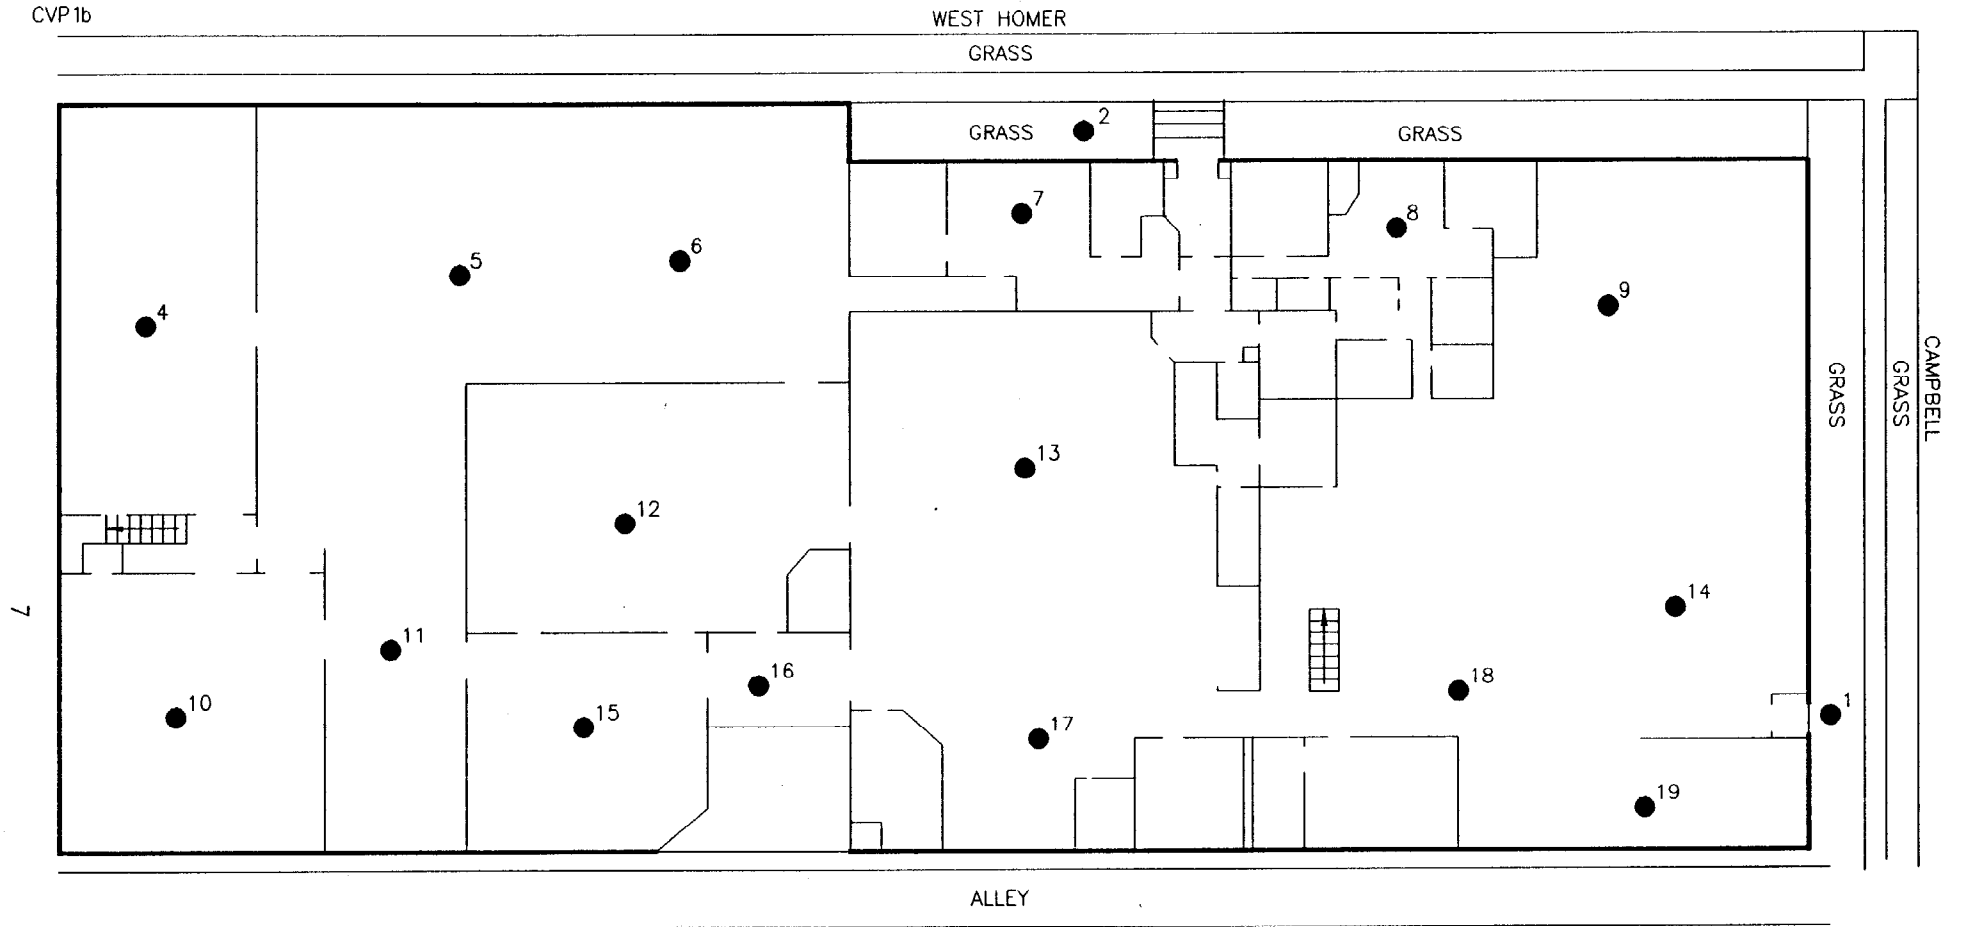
Floor Plan of 2501 West Homer Street Indicating Locations of Exposure Rate Measurements
